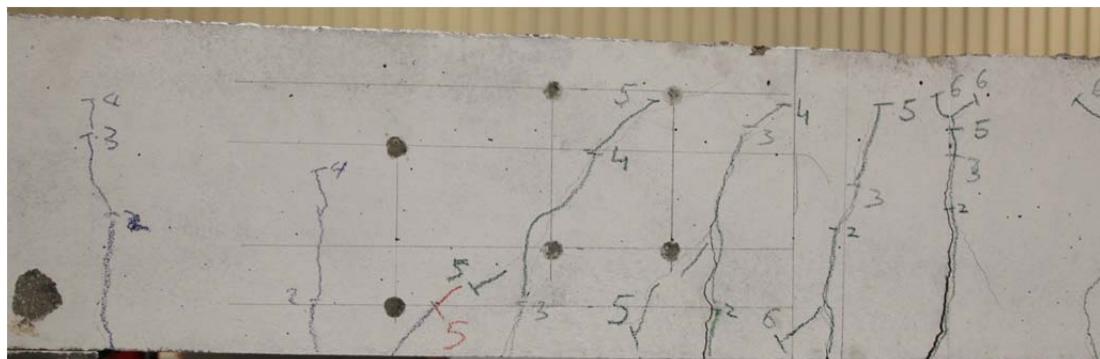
Crack pattern after failure north side. (Picture taken after test A602A3.)
